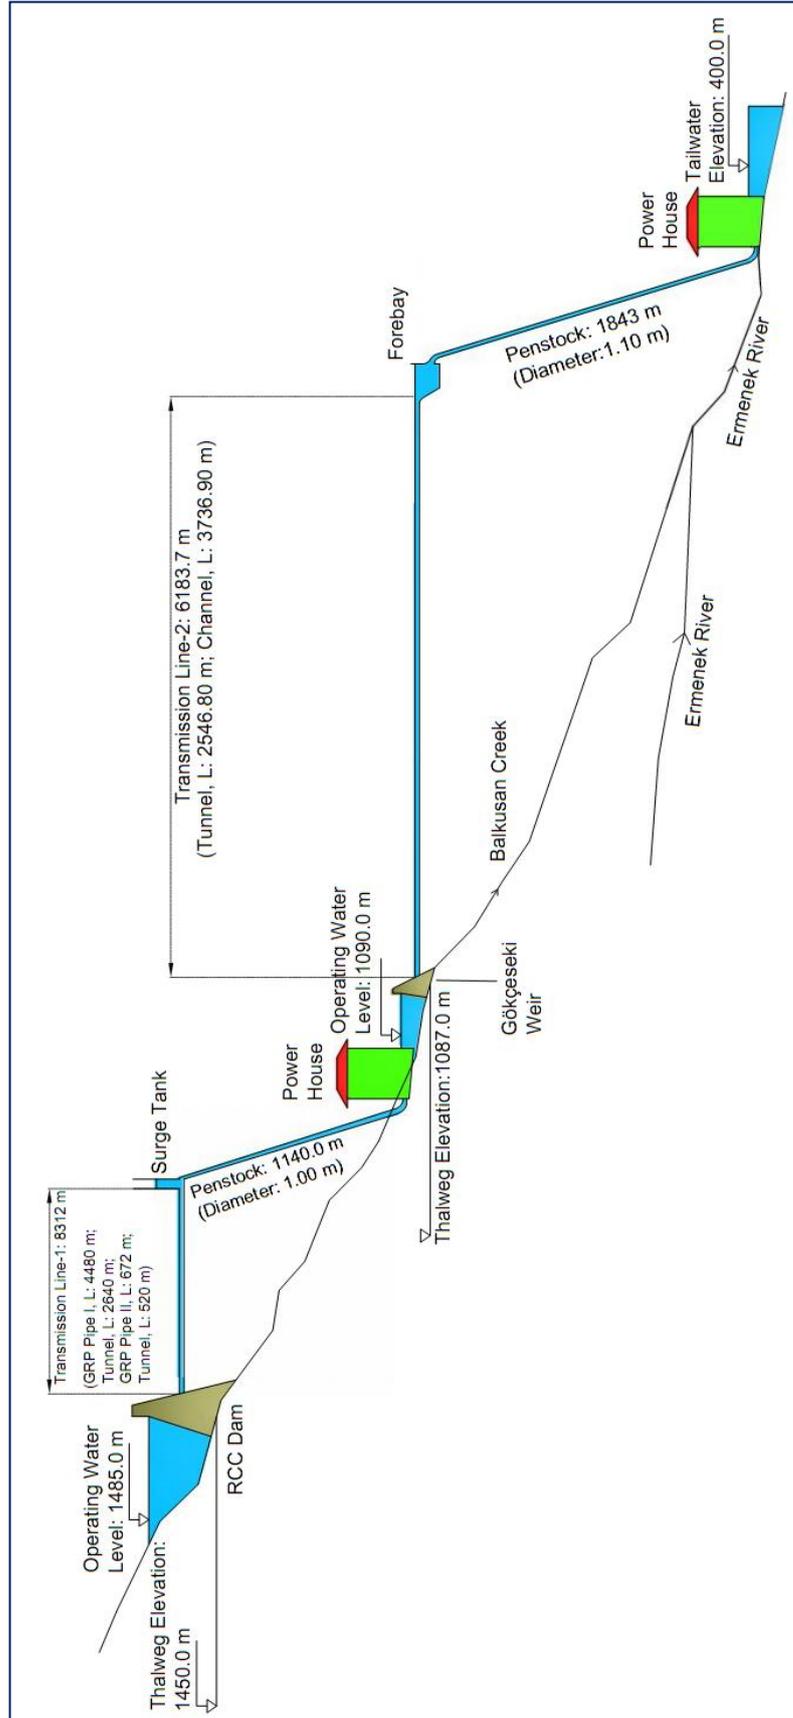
Plan of the EIEI-formulation (Not to Scale)
